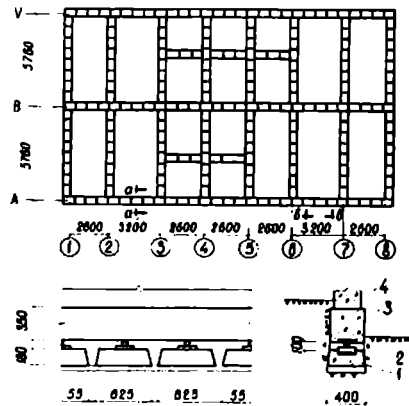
Scheme of the arrangement of dynamometers along the foot of the foundations. (1 - supporting reinforced concrete slab, 2-dynamometer DS-10, 3-reinforced concrete foundation belt, 4-ground floor panel)
